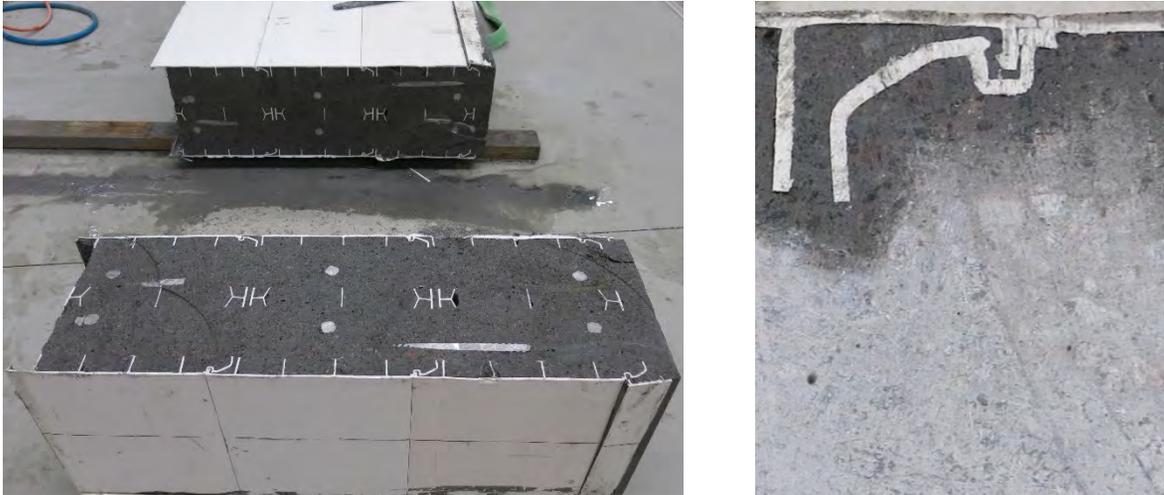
Cut Dintel specimen demonstrating adequate concrete compaction
